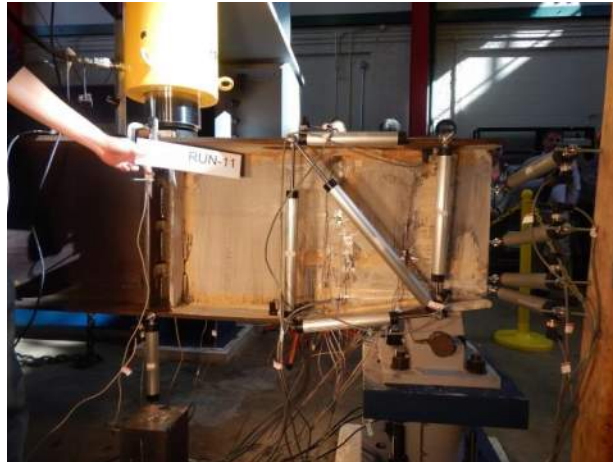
Damaged Girder Left: +1.50 in
